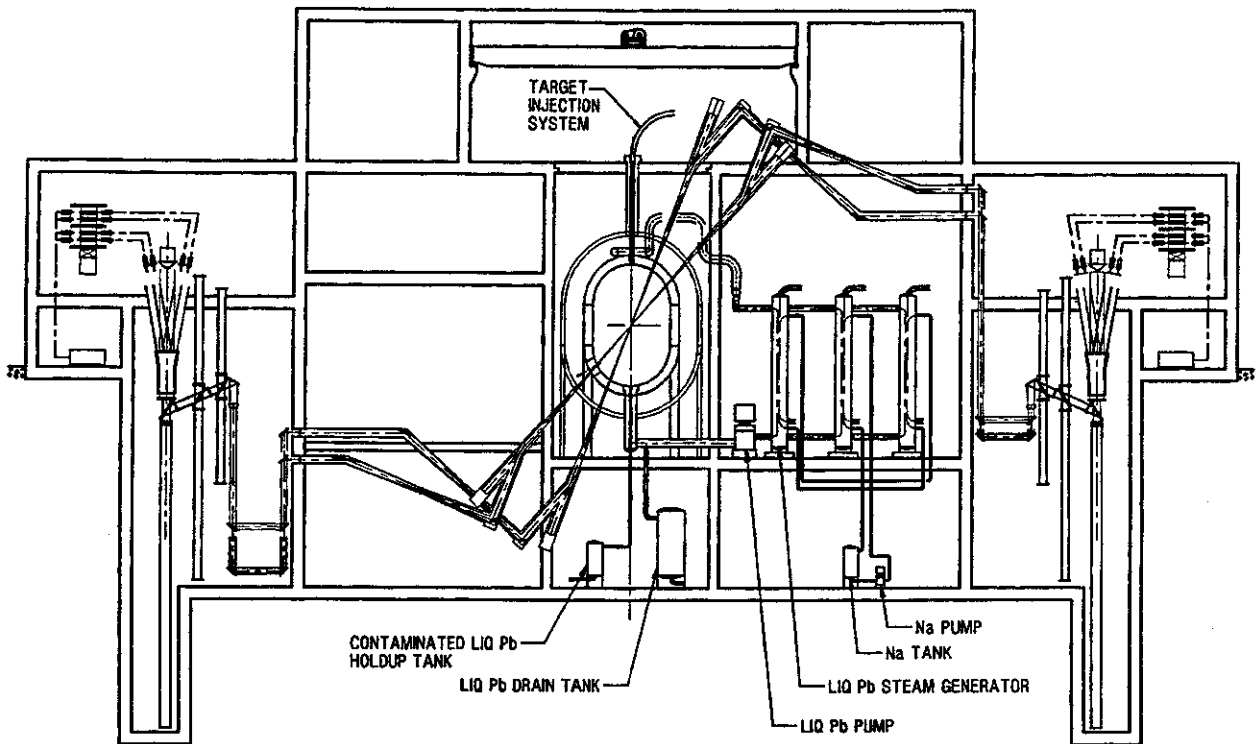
Elevation View - Typical Laser Beam Routing-5 Places
